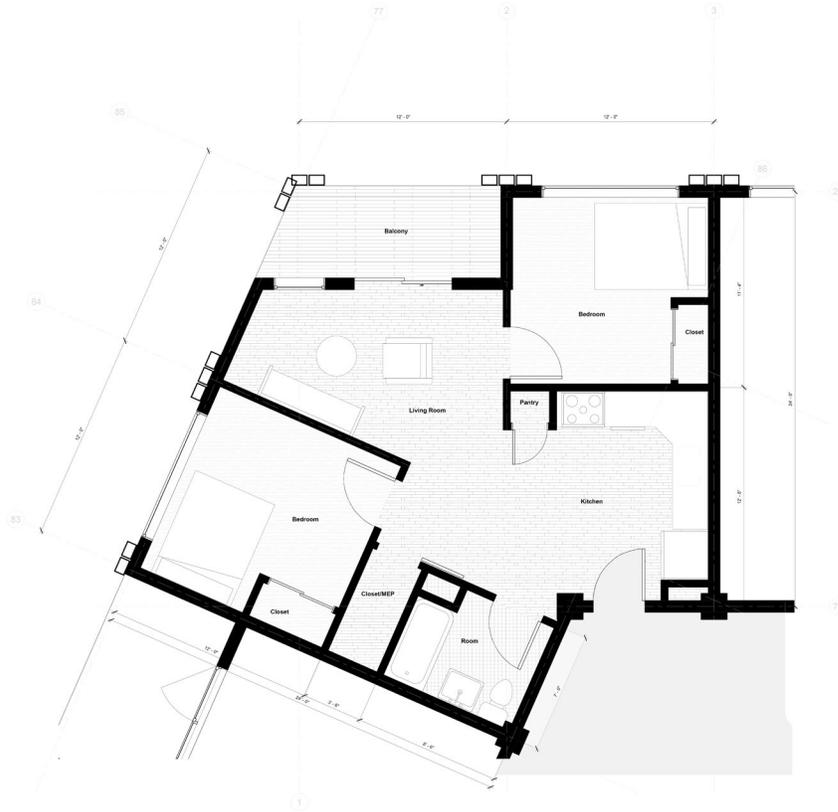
4th through 8th floor typical two bedroom unit floor plan
